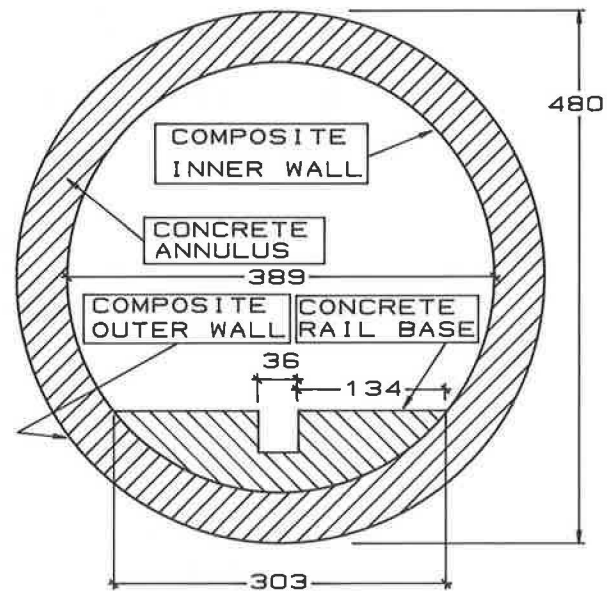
Cross section of the proposed two-track submersible tunnel.
